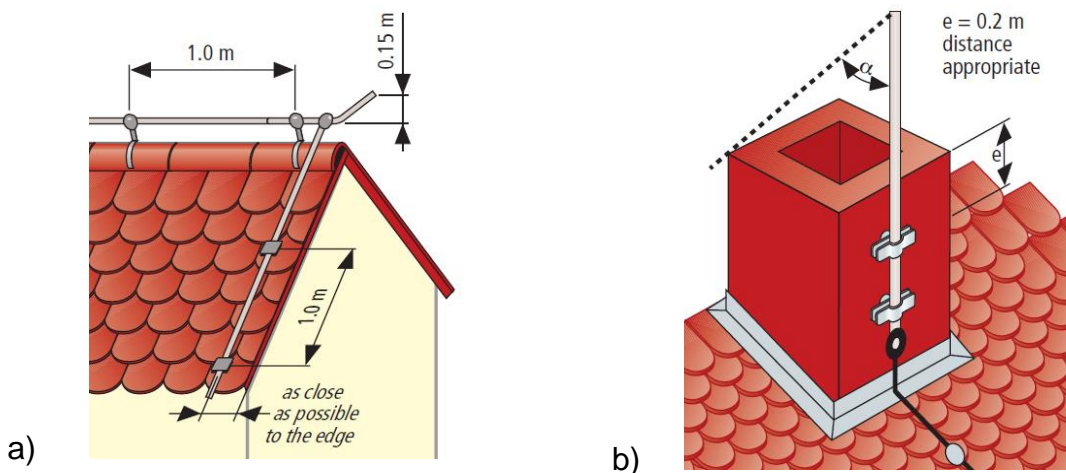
Two examples of air-termination systems on buildings. a) Roof with air termination conductor; b) air-termination rod for a chimney (adapted from [12])
